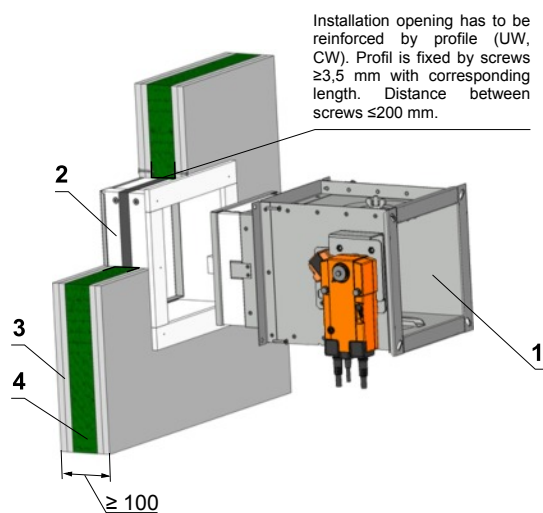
Gypsum wall construction - installation frame E1, E3, E4
